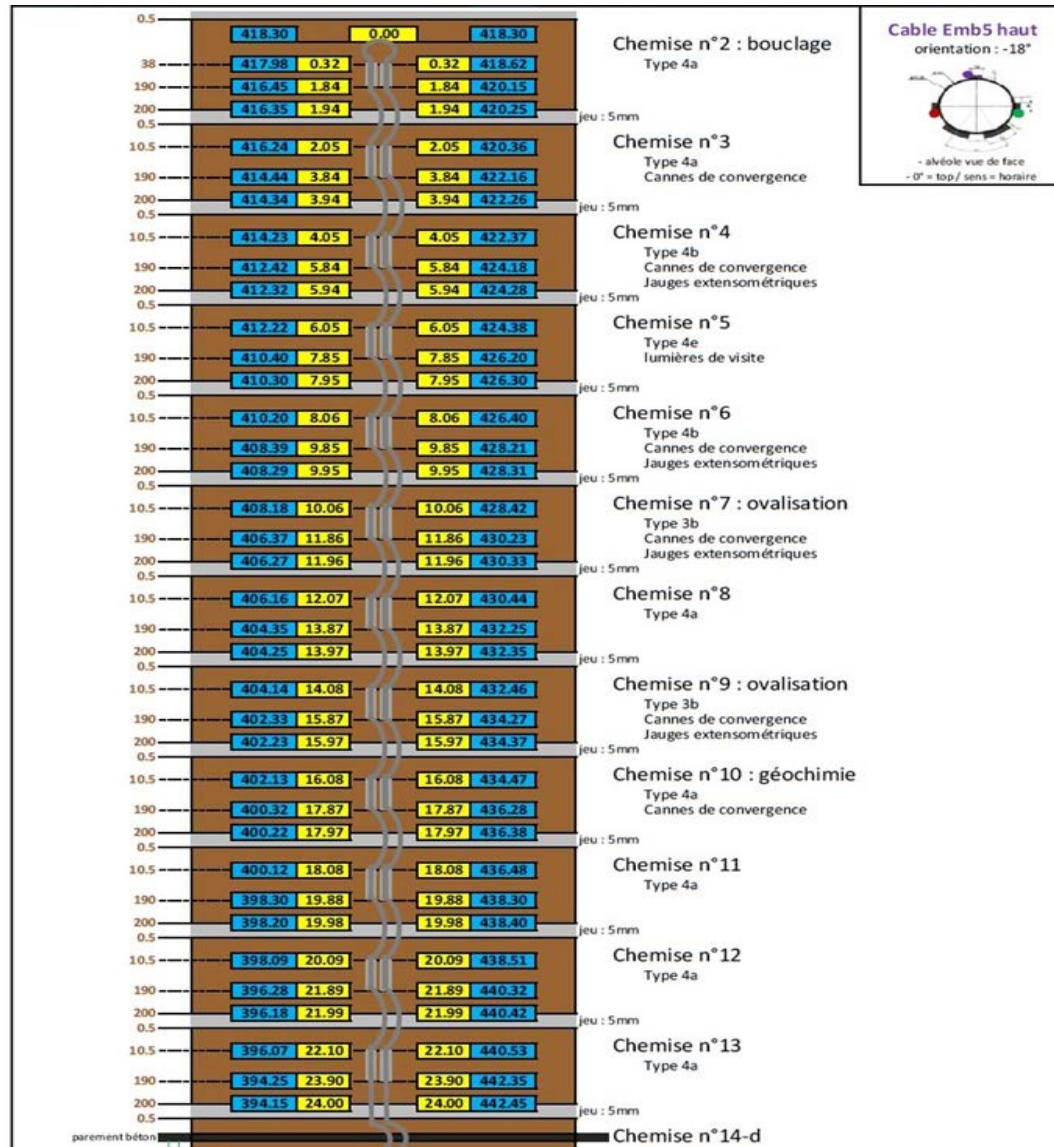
Emboss cable FN-SIL-05 TOP – layout after installation
